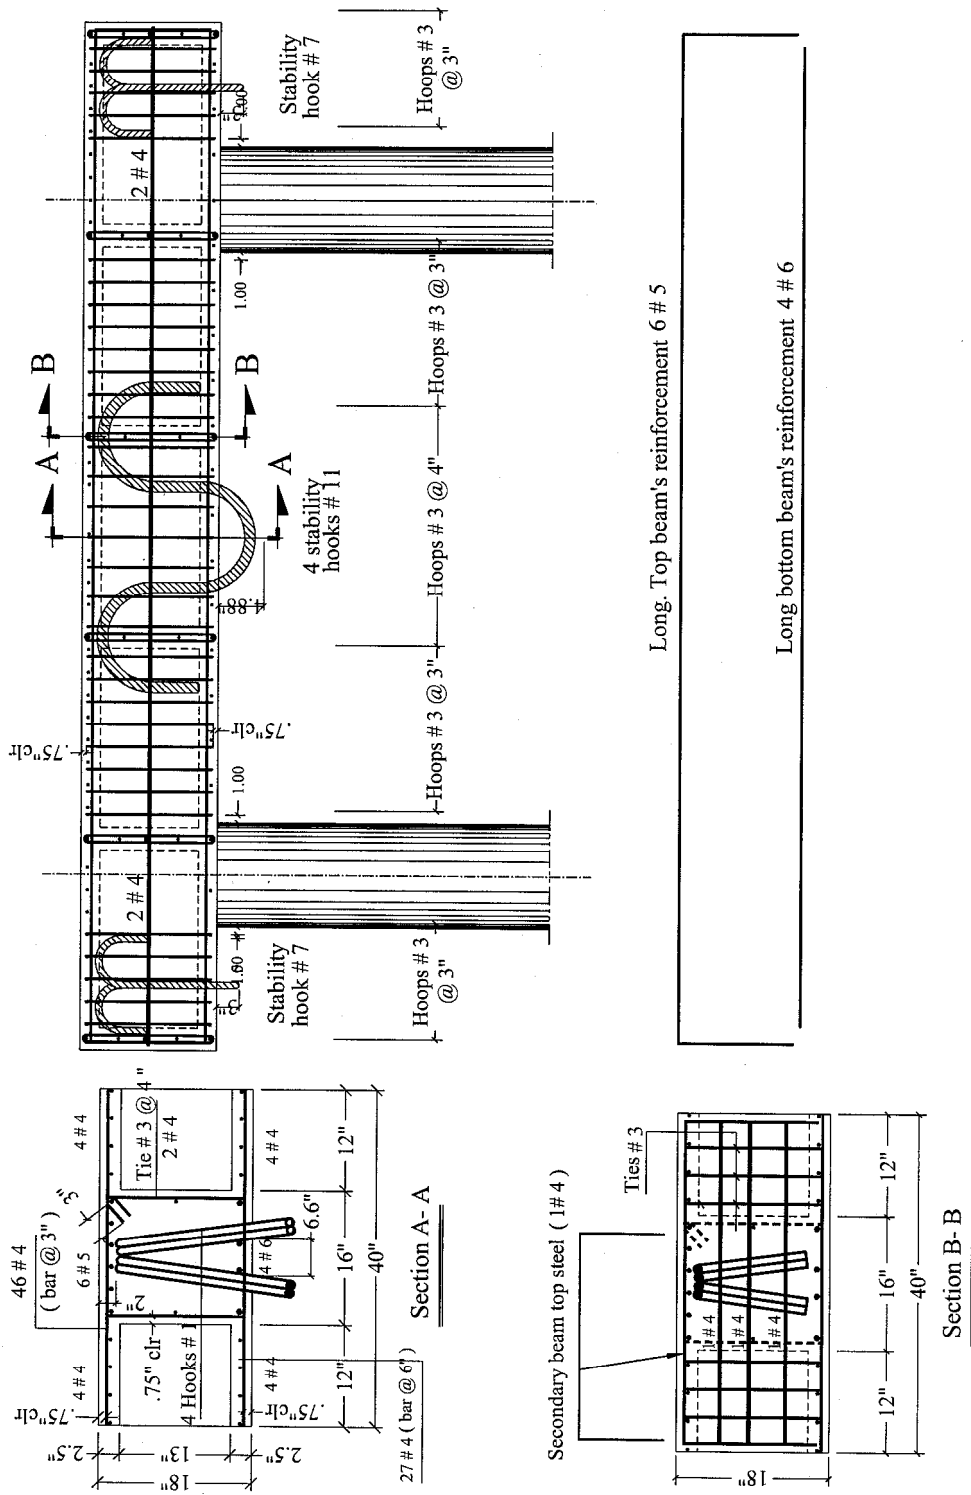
Details of Beam Reinforcement of Specimen B2CS, (English Units)
